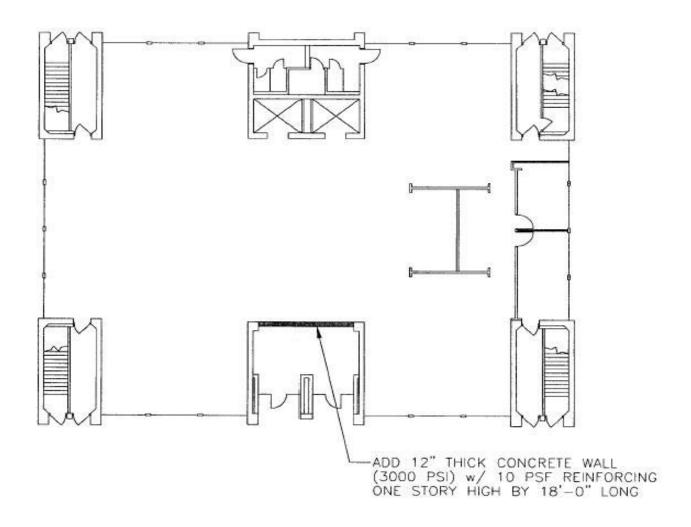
PROPOSED ADDITIONAL WALL LOCATION
